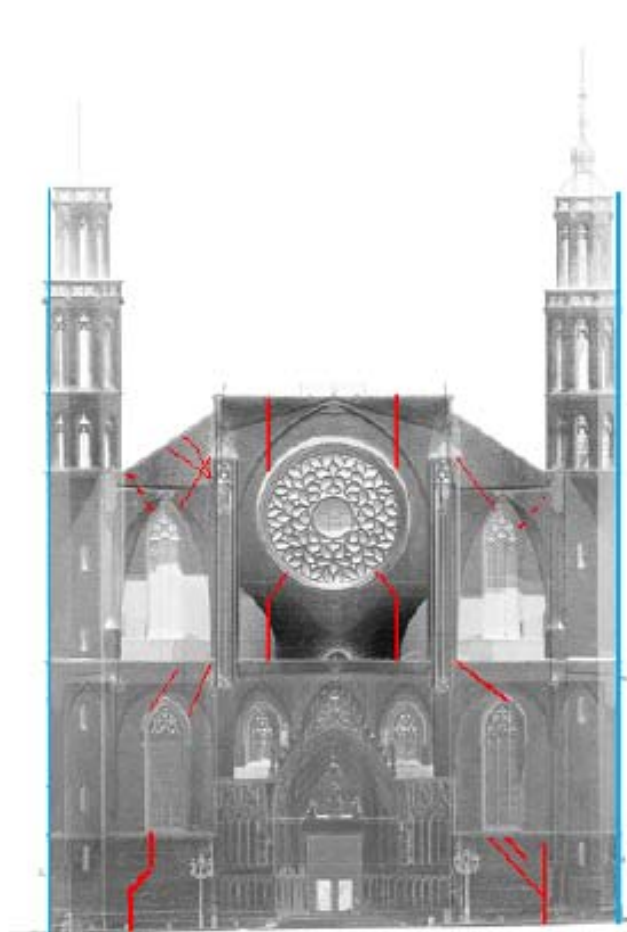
The crack pattern on the front façade according to the previous studies (Caballe, F., Giraldez, P., Gonzales, R., Roca, P. Vendrell, M. 2007)
